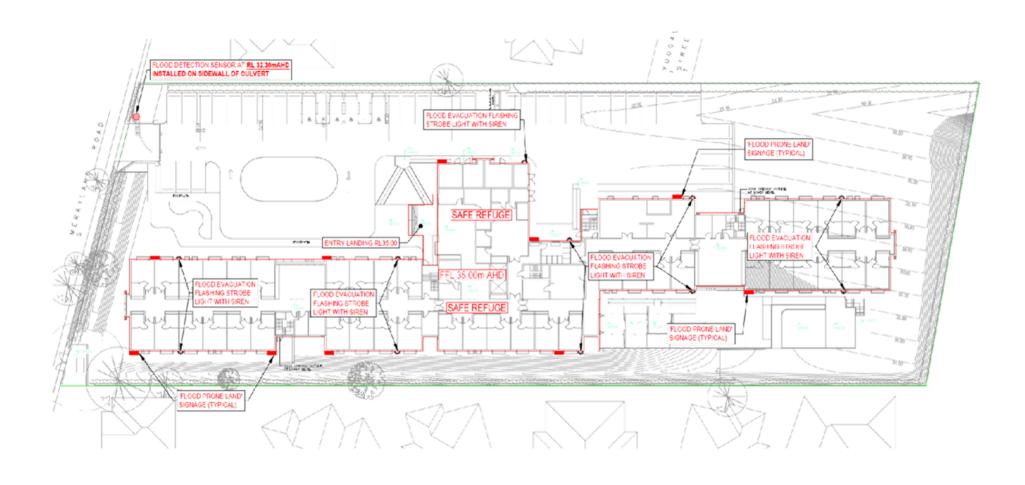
Site Flood Warning System and Flood Signage locations
